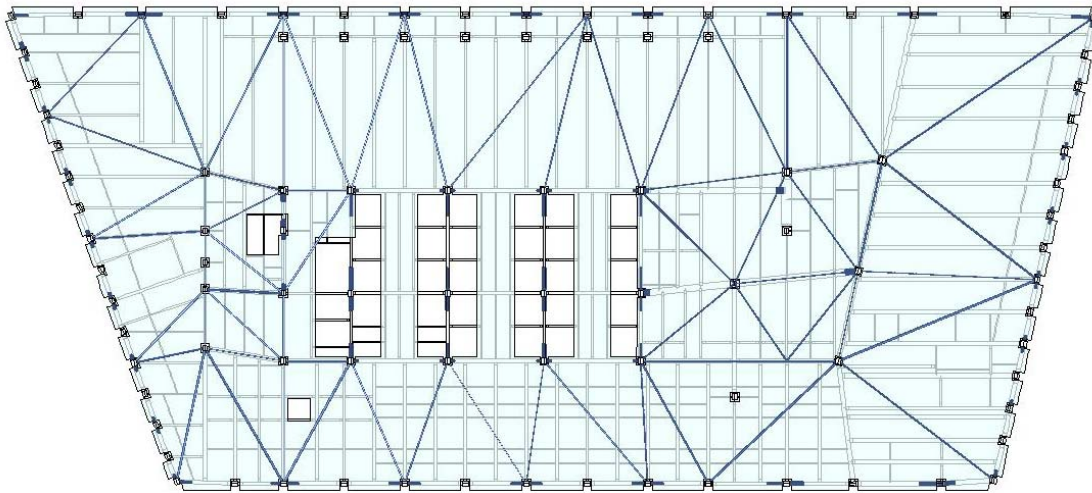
Model of the fifth floor diaphragm framing plan.
